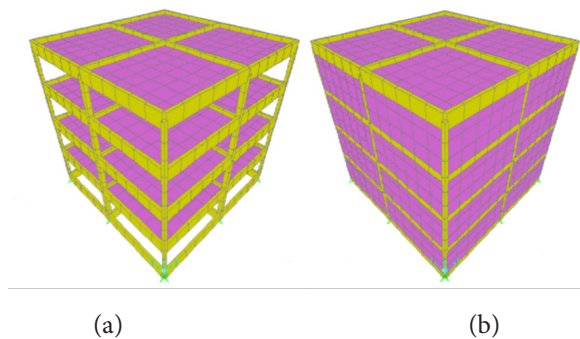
(a) Three-dimensional model of the building without masonry and (b) Model with masonry.
